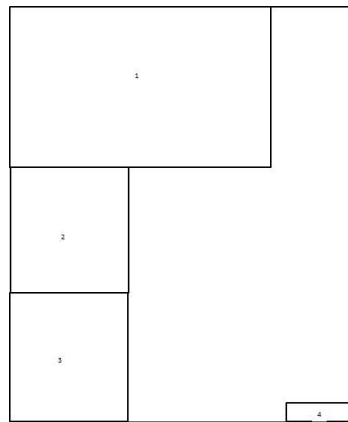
18 Plan 2nd floor Latar Ijen Resto & Coffeeshop
